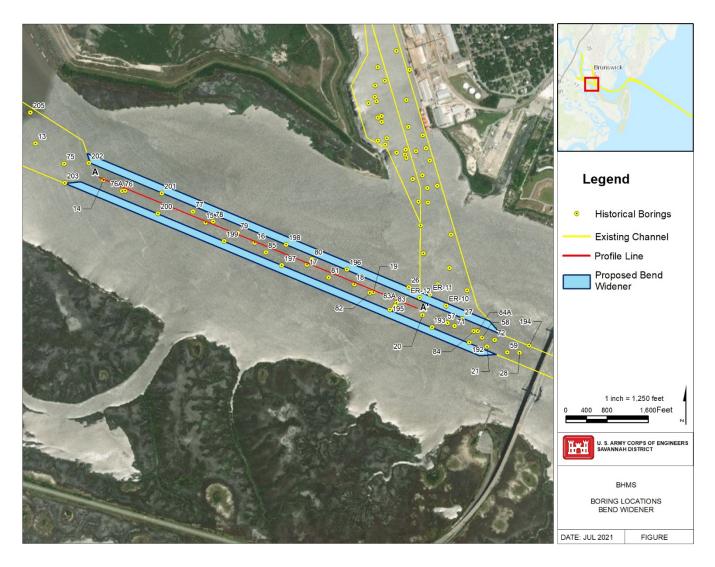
Boring Locations and Locations of Profile A-A' at the Sidney Lanier Bridge Meeting Area
